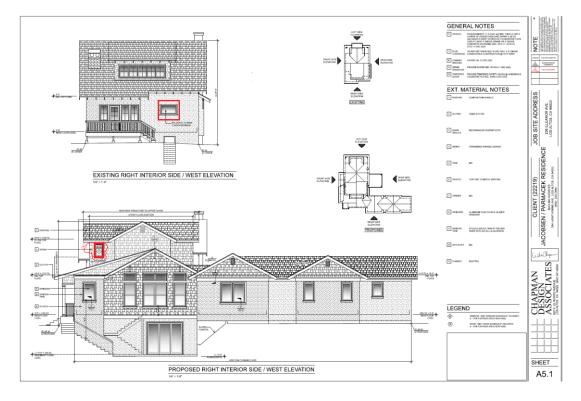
Sheet A5.1 shows the original windows that will be relocated and their proposed locations (Chapman Design Associates, 10/17/2024).
